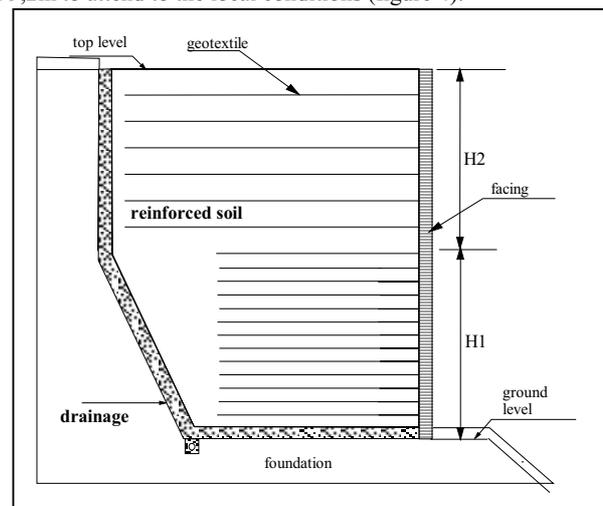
The cross section of the reinforced wall in km 16 of the MG 030
